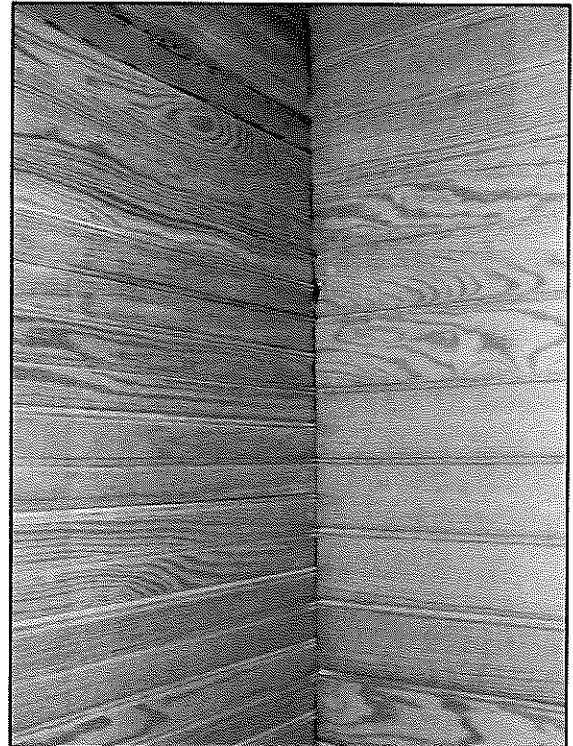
Two types of “bead-board” sheathing used in attic hallway
